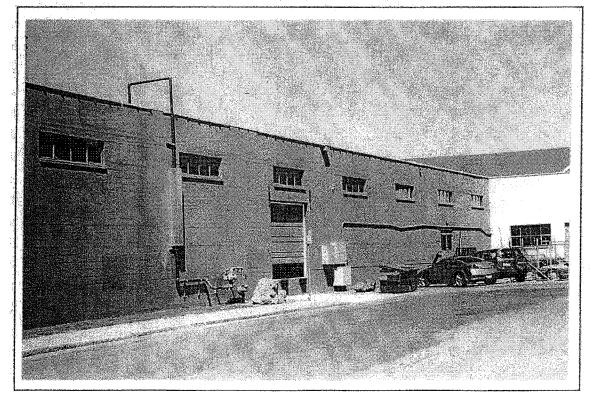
View of East Façade Near North End (Showing New Loading Door & Existing Pedestrian Doors) 210 W. Pacific-Roundup
